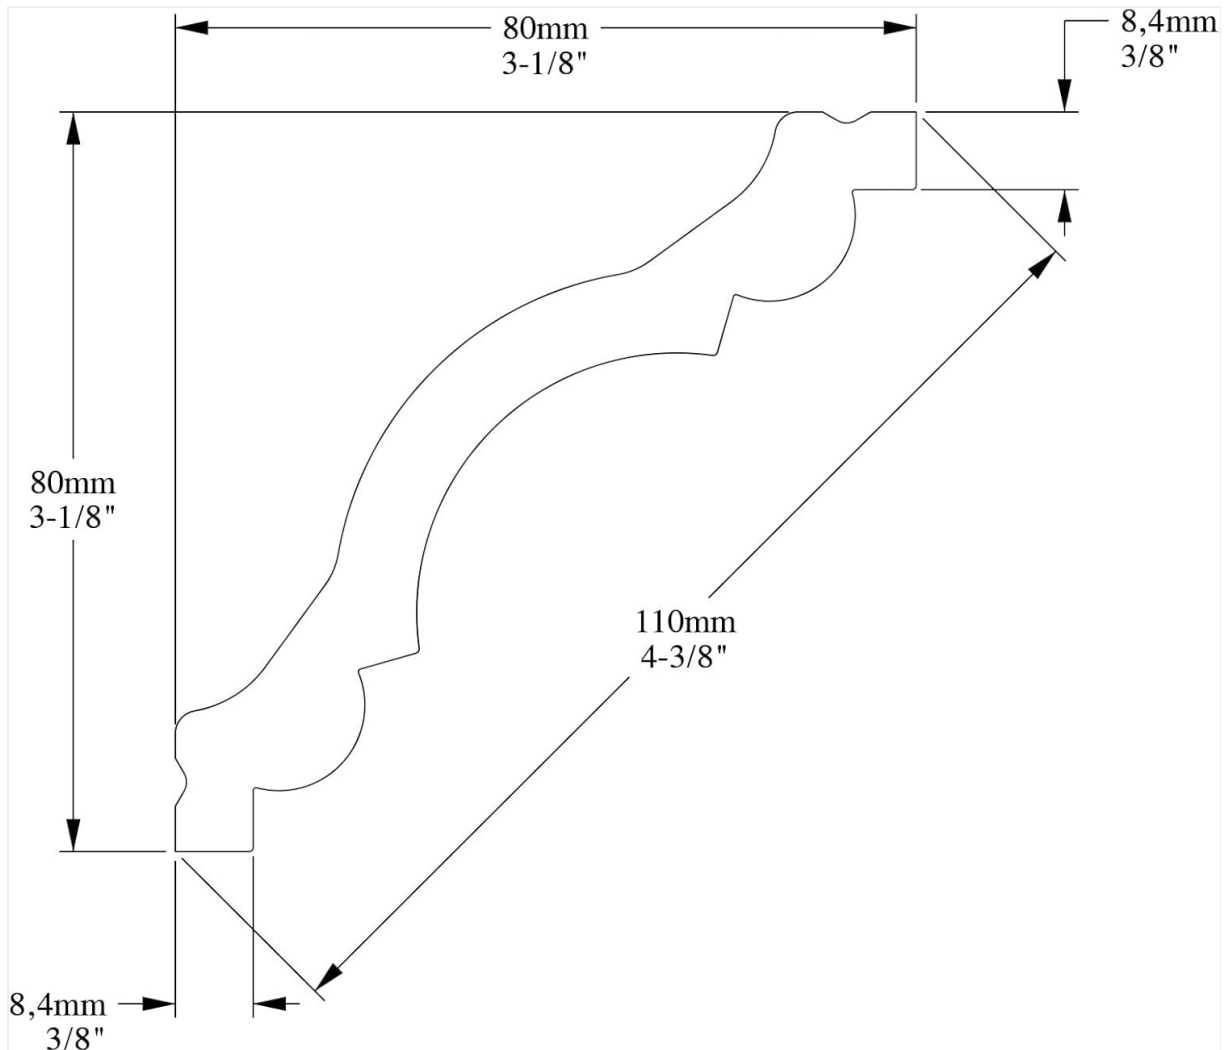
Detailed technical drawing of the CX123 moulding, showing precise dimensions in both millimeters and inches for accurate planning and cutting.
